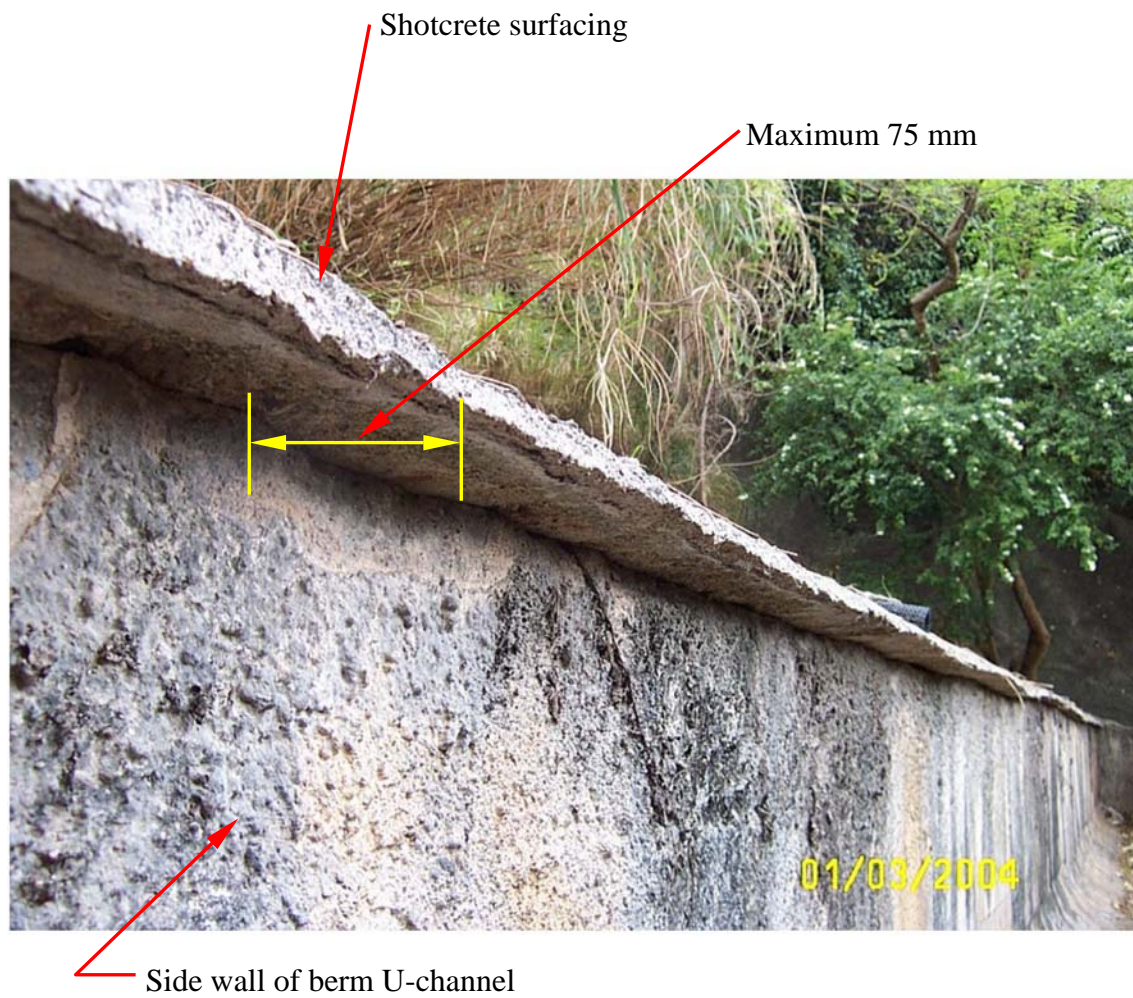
Example of Shotcrete Surfacing Overhanging Berm U-channel
